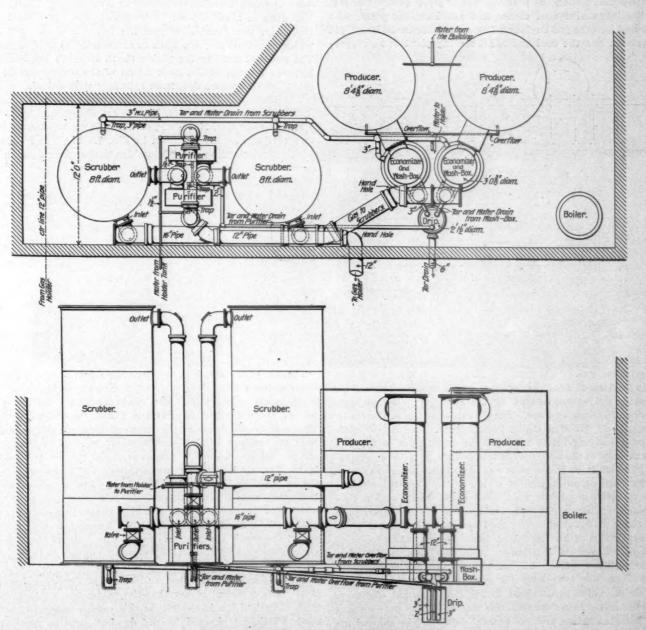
Plan and Side Elevation of the Taylor Gas Producers.
